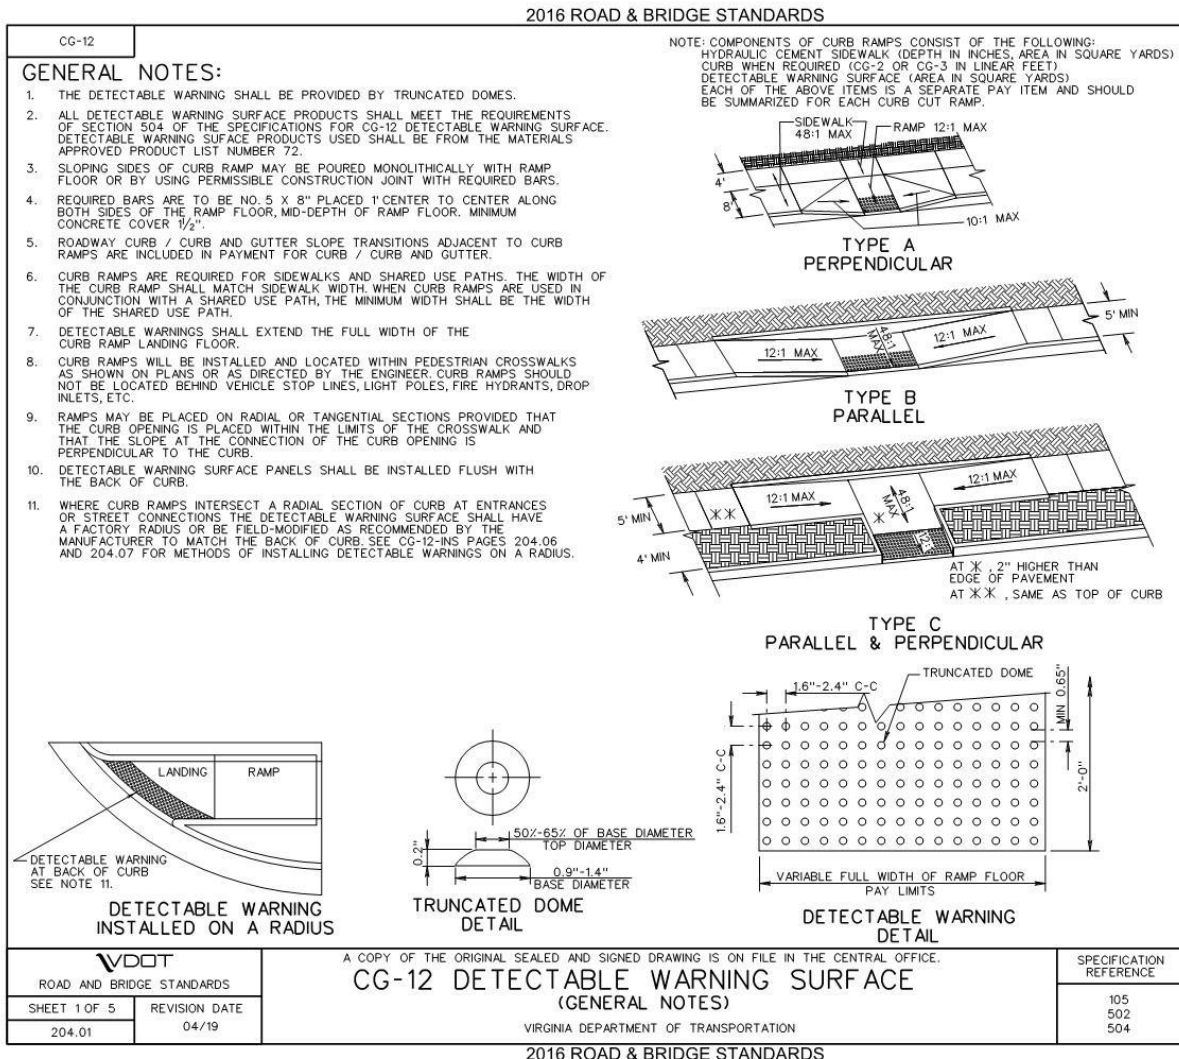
VDOT's 2016 Road and Bridge Standards, CG-12 Detectable Warning Surface, standard drawing shows the engineering design details of three different types of curb ramps, as well as detectable warning surface details. Only one sheet of CG-12 drawing (Sheet 1 of 5) is shown in this figure and the remaining CG-12 pages can be found in VDOT's 2016 Road and Bridge Standards.
